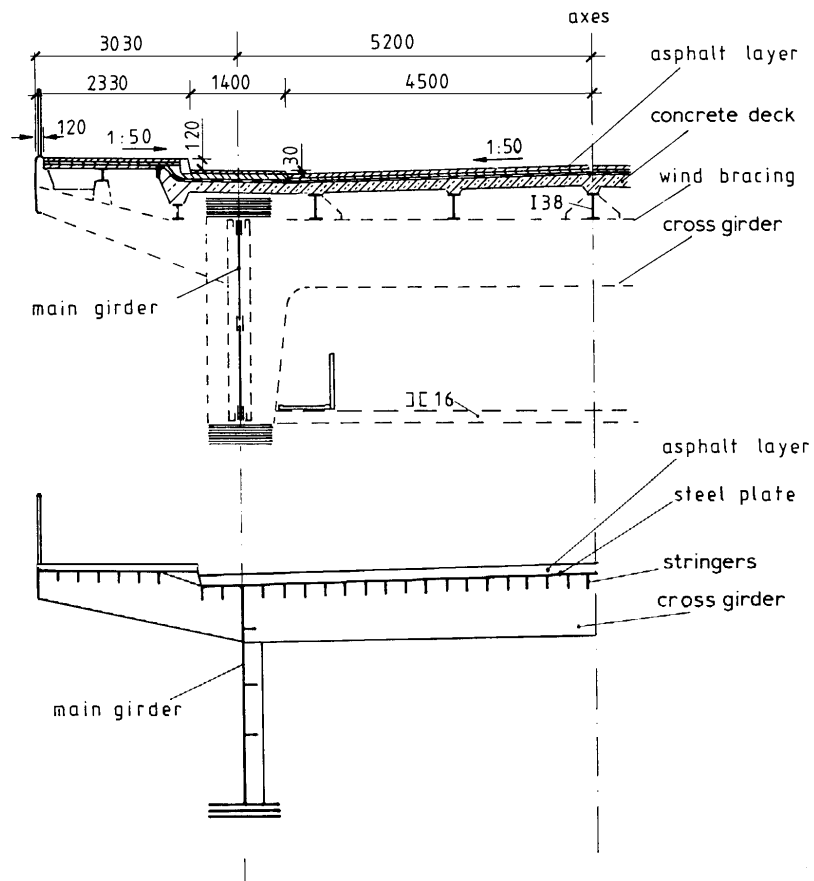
Traditional prewar bridge design with independent main girders, transverse beams, longitudinal girders and bridge deck and steel bridge with an orthotropic deck.
